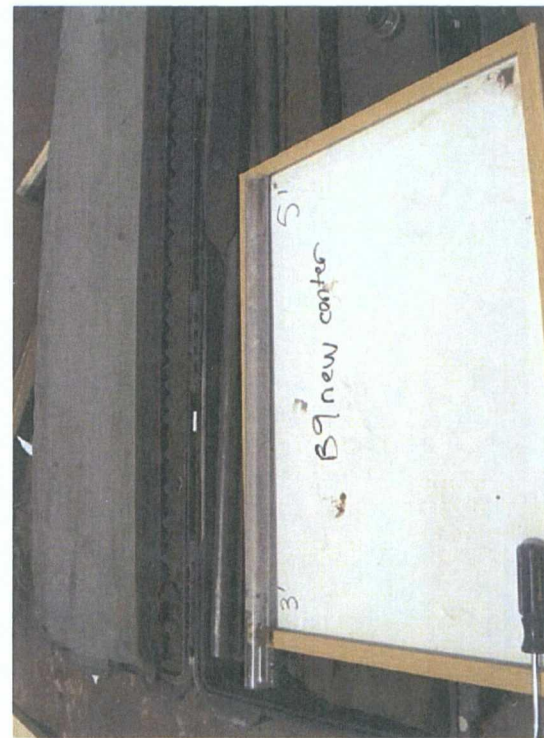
B9 new Center 5' - Sample on whiteboard: first half
